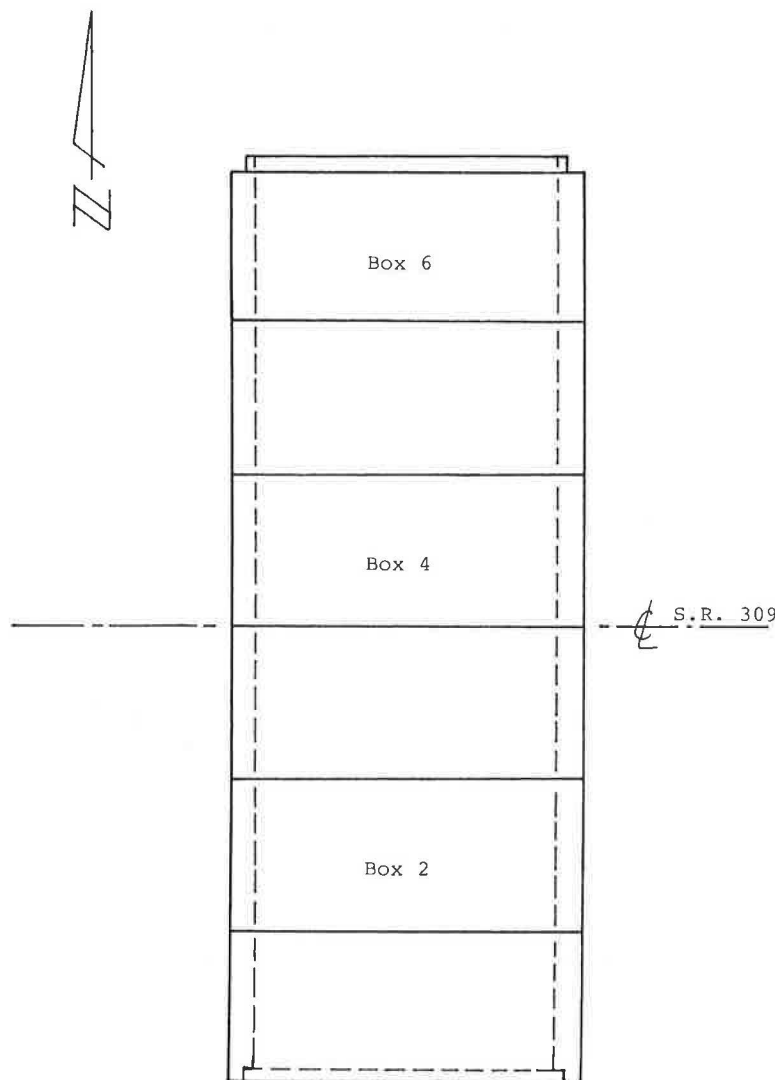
Arrangement of box culvert sections (Ohio DOT bridge MAR-309-09.42).
